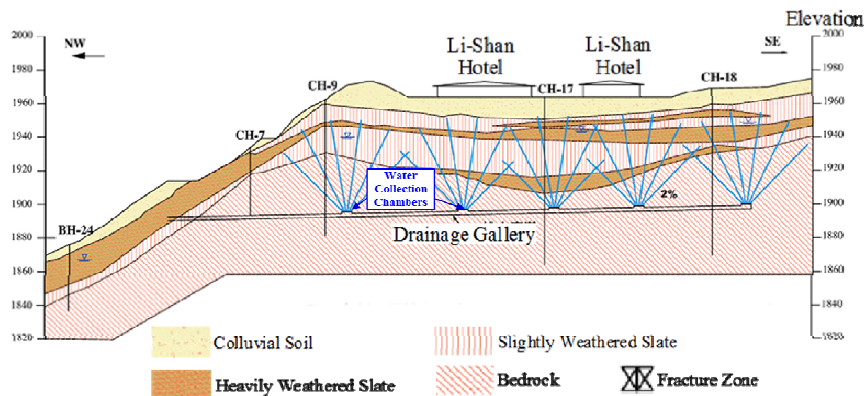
Geological cross section and location of the drainage gallery (*G1*-gallery)
